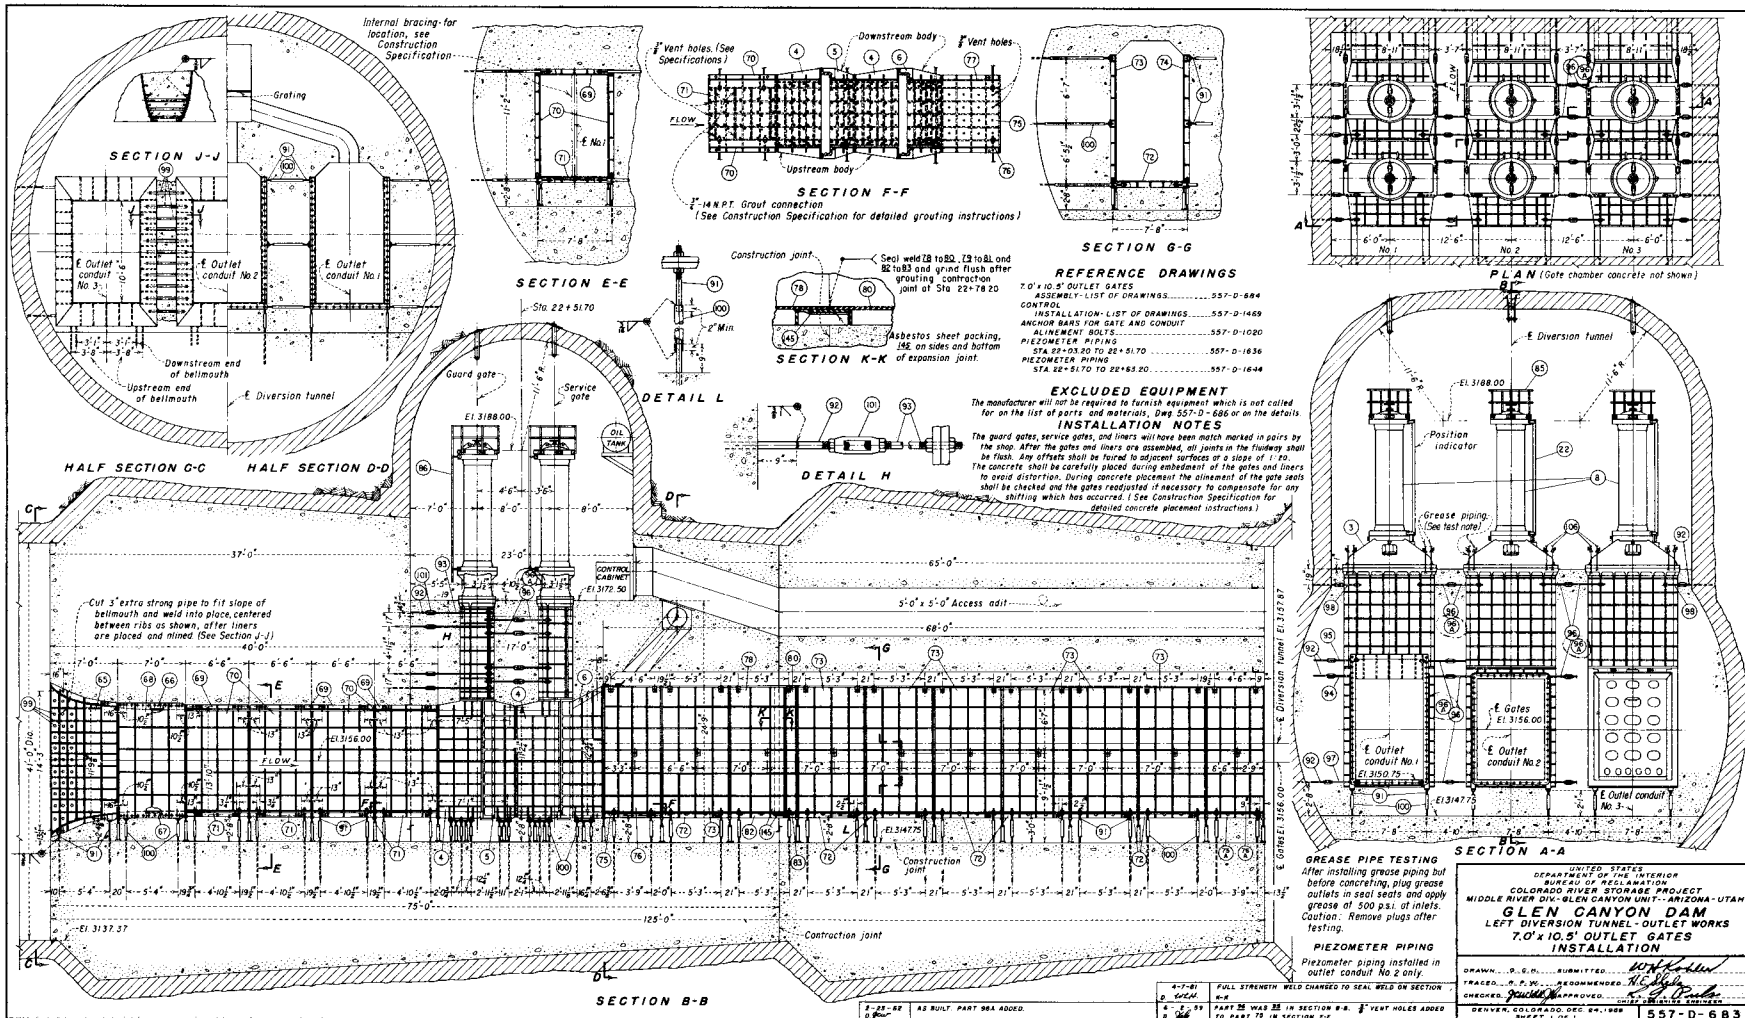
Left diversion tunnel outlet works—7.0- by 10.5-foot outlet gates installation.
